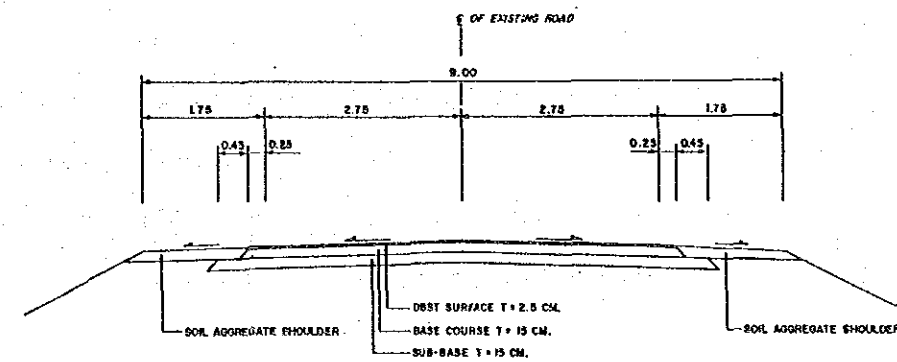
FIGURE TYPICAL PAVEMENT STRUCTURE FOR FLEXIBLE PAVEMENT IM-2
